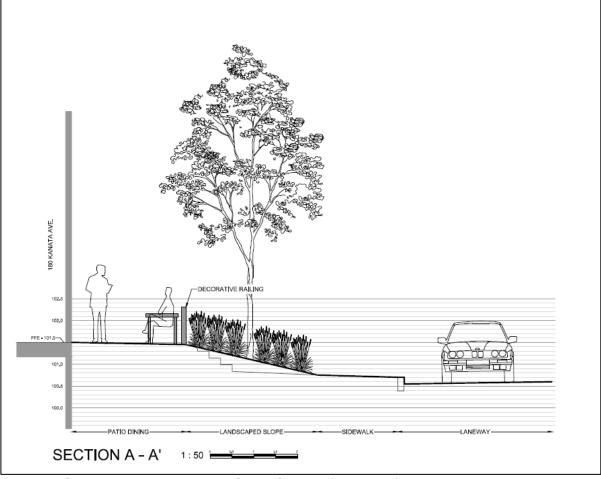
Streetscape Landscaping Cross Section (Novatech)
